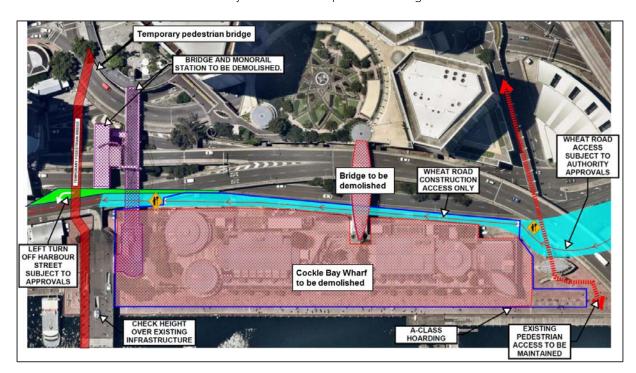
| Preliminary demolition plan (source: Applicant's Amended EIS)
